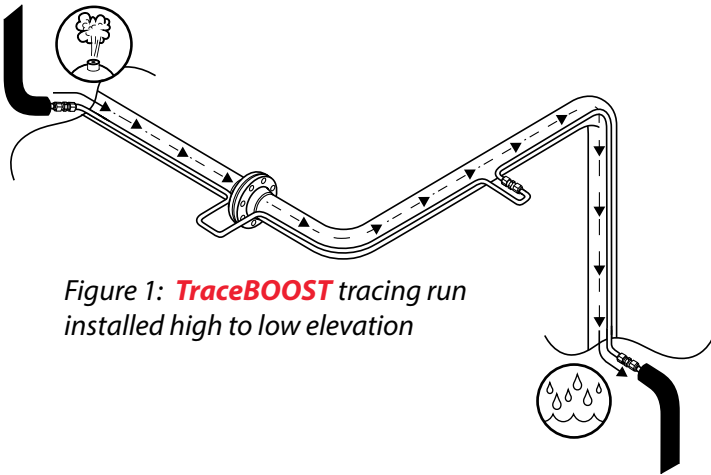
TraceBOOST tracing run installed high to low elevation
